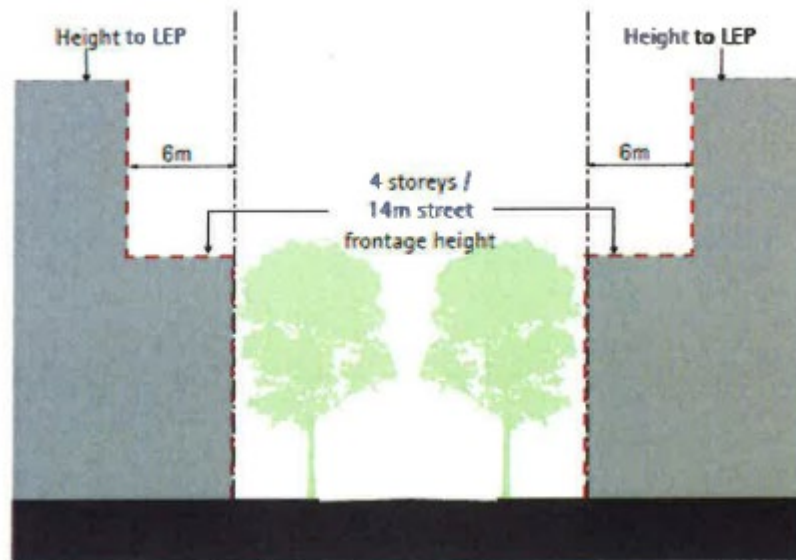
4 storeys/14 metre street frontage height
